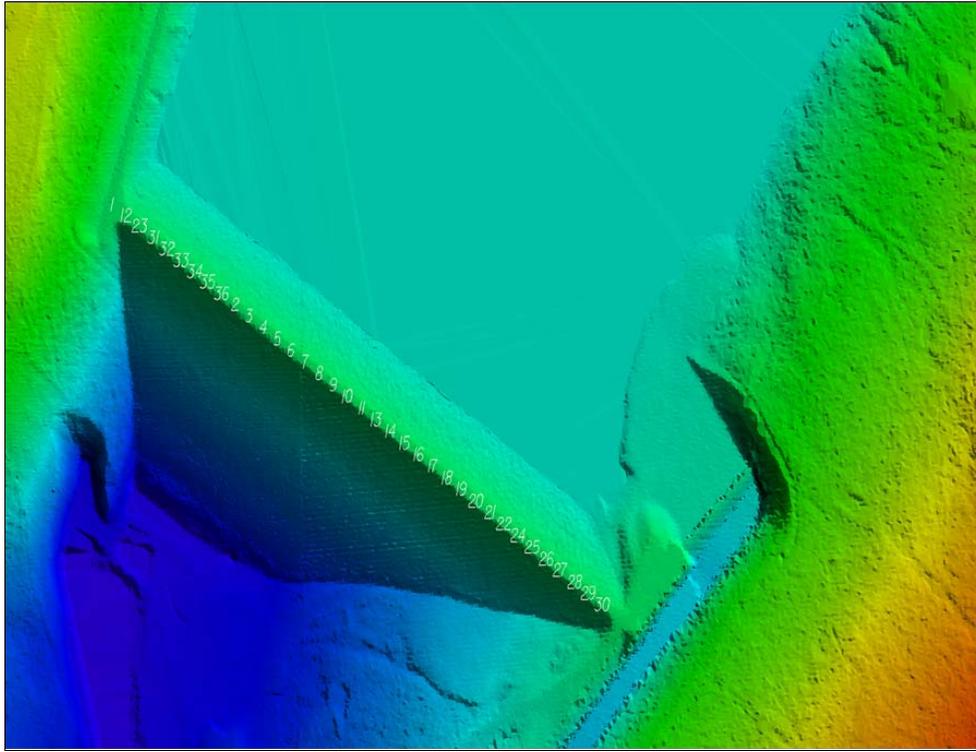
Bare Earth LIDAR Surface showing Dam profile stations.
